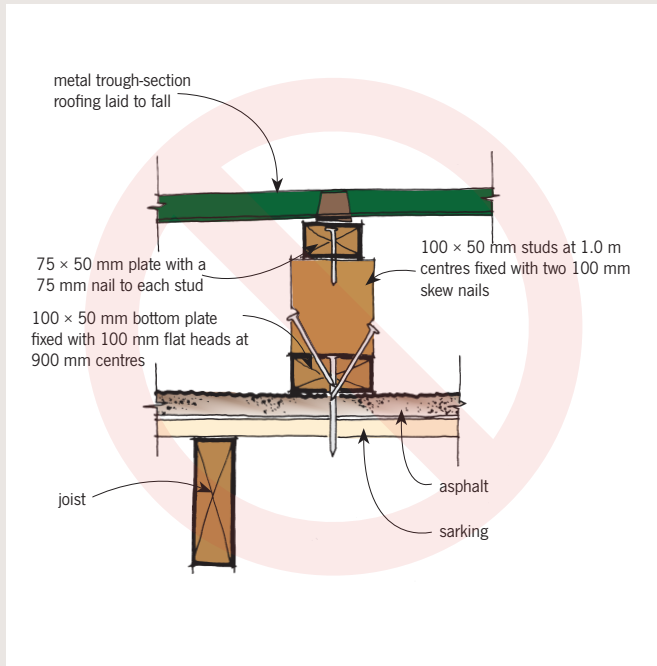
Failed roof detail. The failure was caused by the inadequate fixings.
